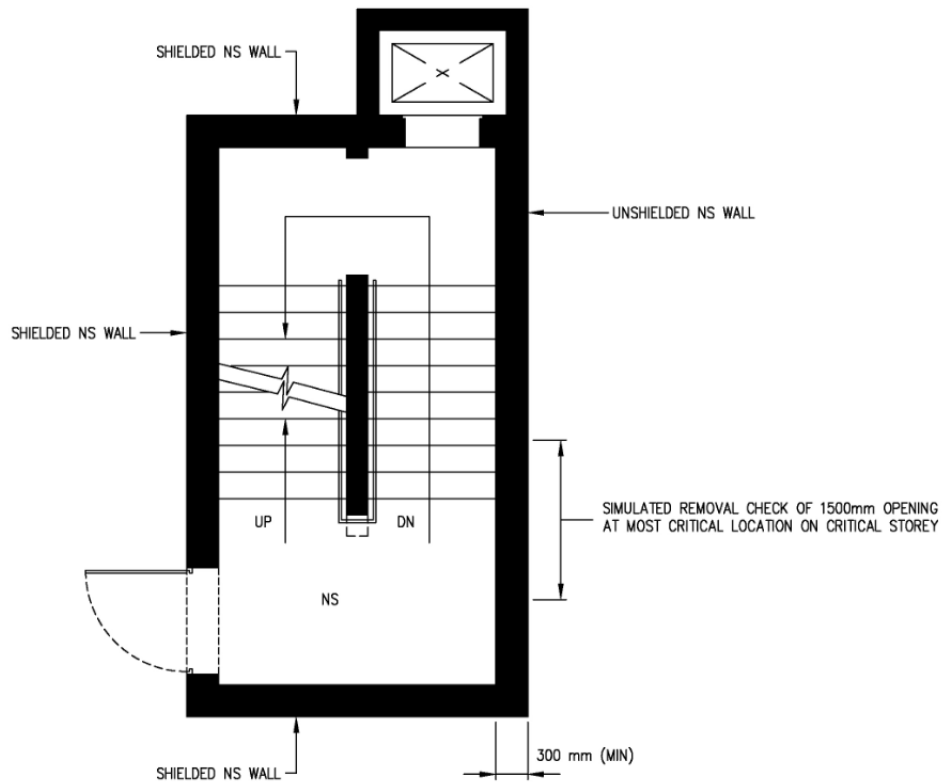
D : UNSHIELDED NS WALL OF S/C SS TOWER
